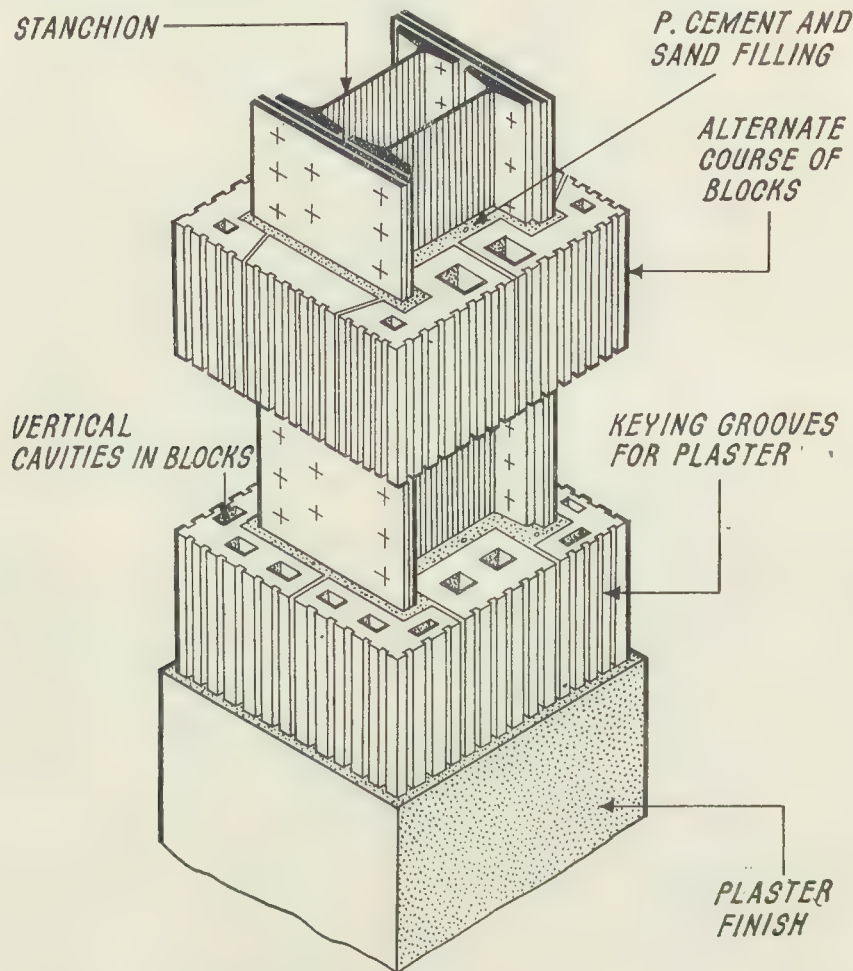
ENCASING STEEL STANCHION WITH BURNT CLAY BLOCKS
